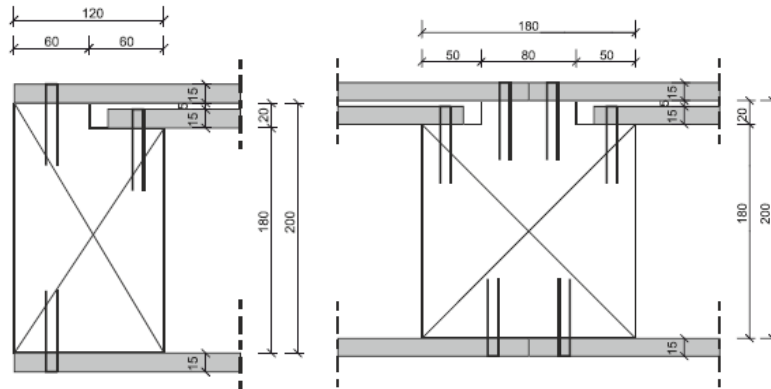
Link between OSB panels of the Power wall and softwood studs.
